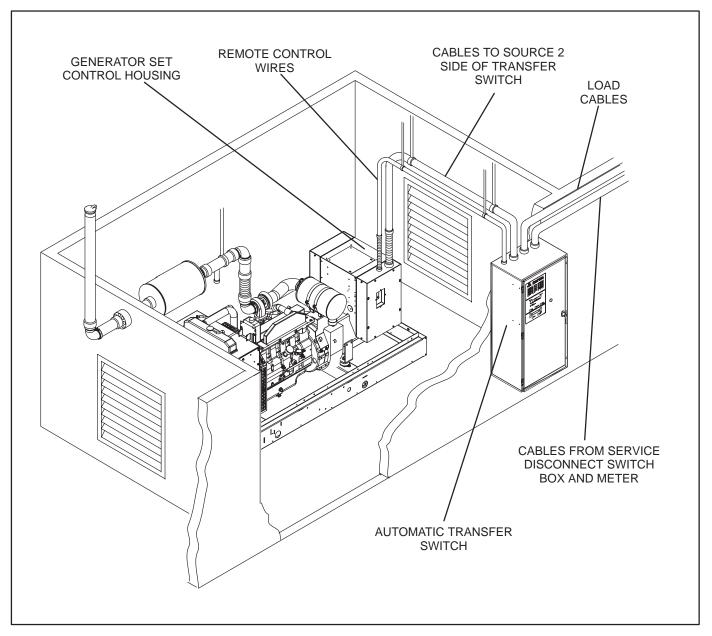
TYPICAL WALL-MOUNT INSTALLATION
